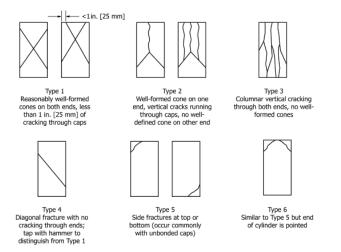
Typical fracture patterns in compressive strength test on concrete specimens
